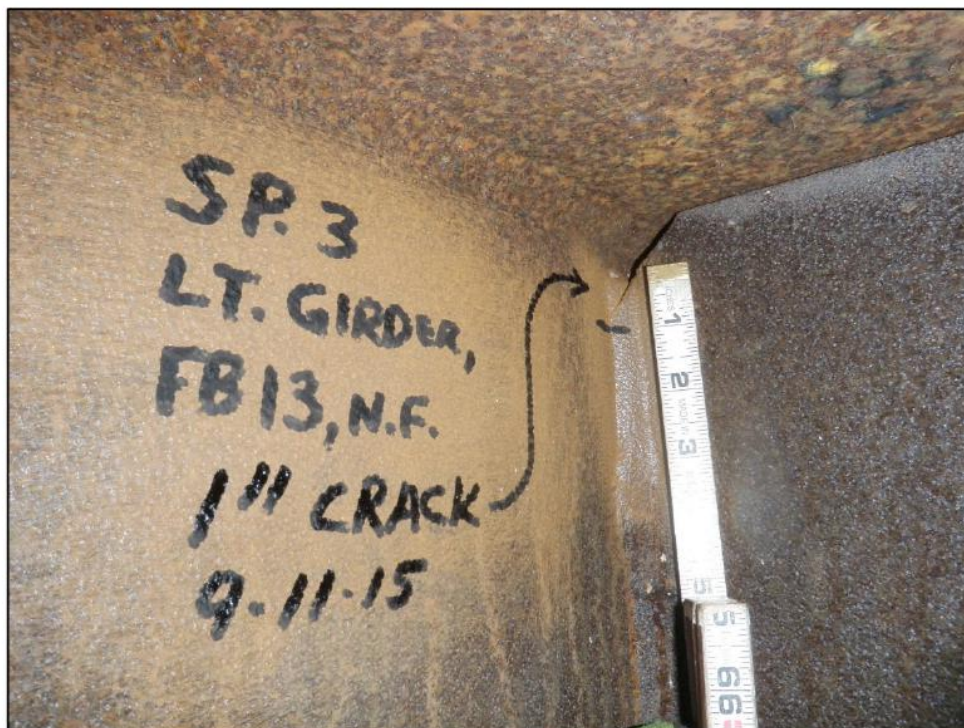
Location of Fracture-Critical Members. Type ST crack at top of floorbeam connection plate-to-girder web weld (AASHTO Problematic Detail).
